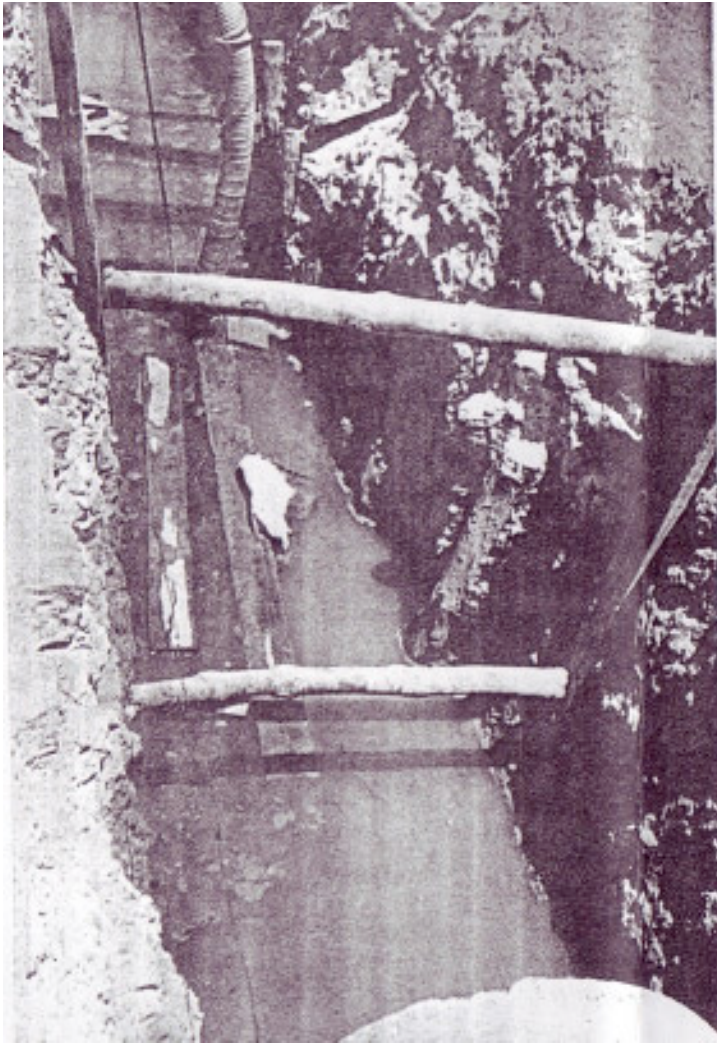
Wooden piles found in the Zanja de la Avenida (Archivo Collantes de Terán Delorme).
